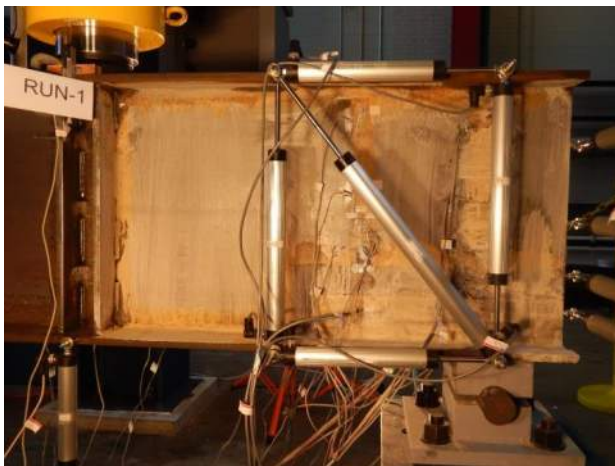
Damaged Girder Left: 8 kip
